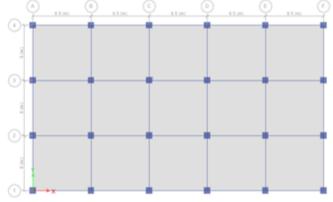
Model 1 – Floor plan of the structure without shear wall.
